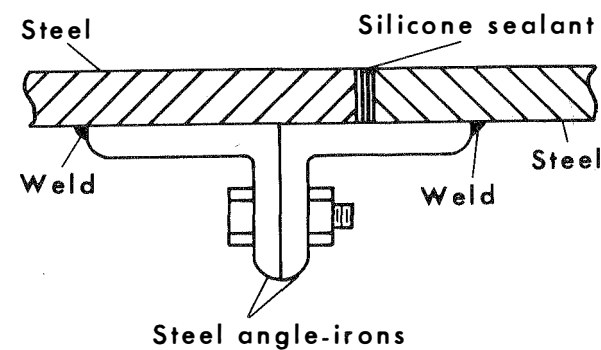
Joint between steel floor sections (after Daly, 1965).
